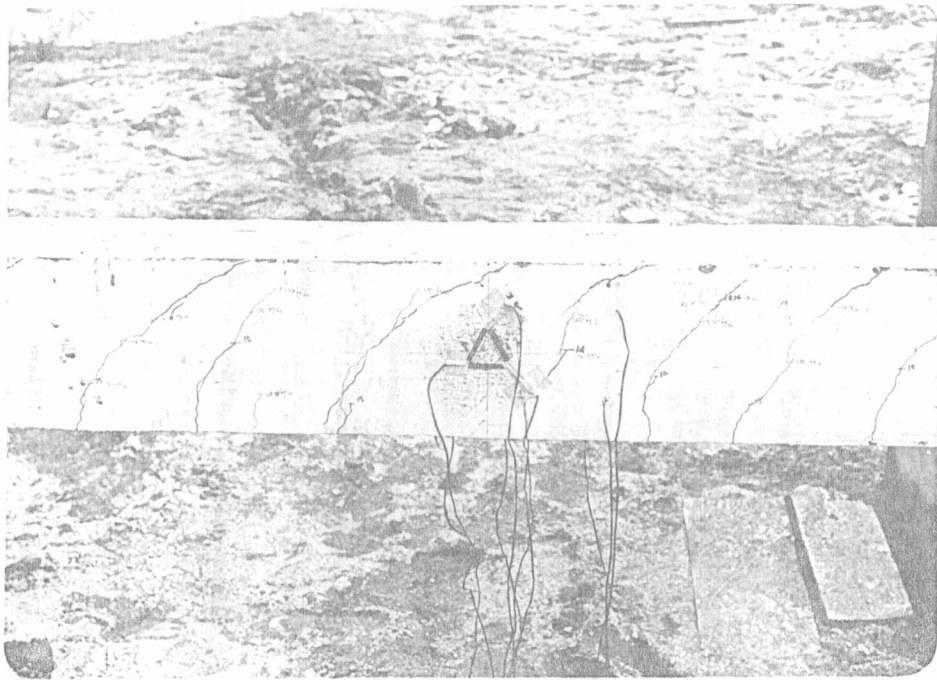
Z-beam Model; Crack Paths at Support, on Stronger Side of Beam.
